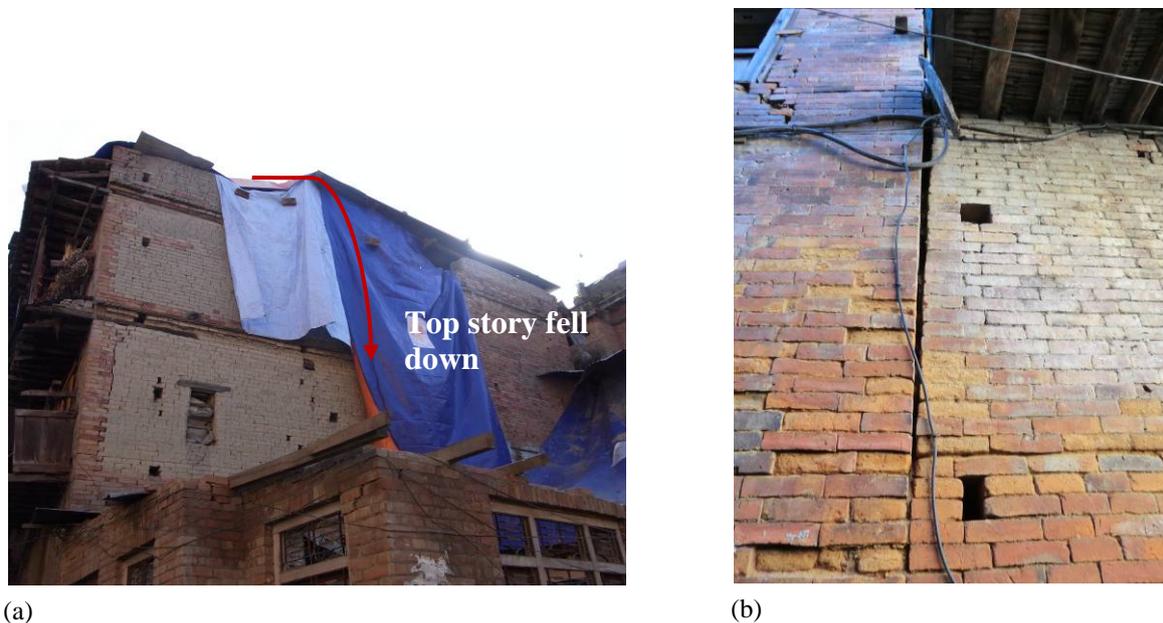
(a) Top story of the left building (brick masonry with mud mortar) collapsed on to the roof of a building (brick masonry with cement-sand mortar) under-construction, leading to the collapse of the roof of the latter. The age of the existing building is 60 years. (b) Separation between two buildings due to the earthquake. The building on the left is made of the *first-class brick*, while that on the right is made of the *second-class brick*. Pounding between adjacent buildings could also have exaggerated the separation.
